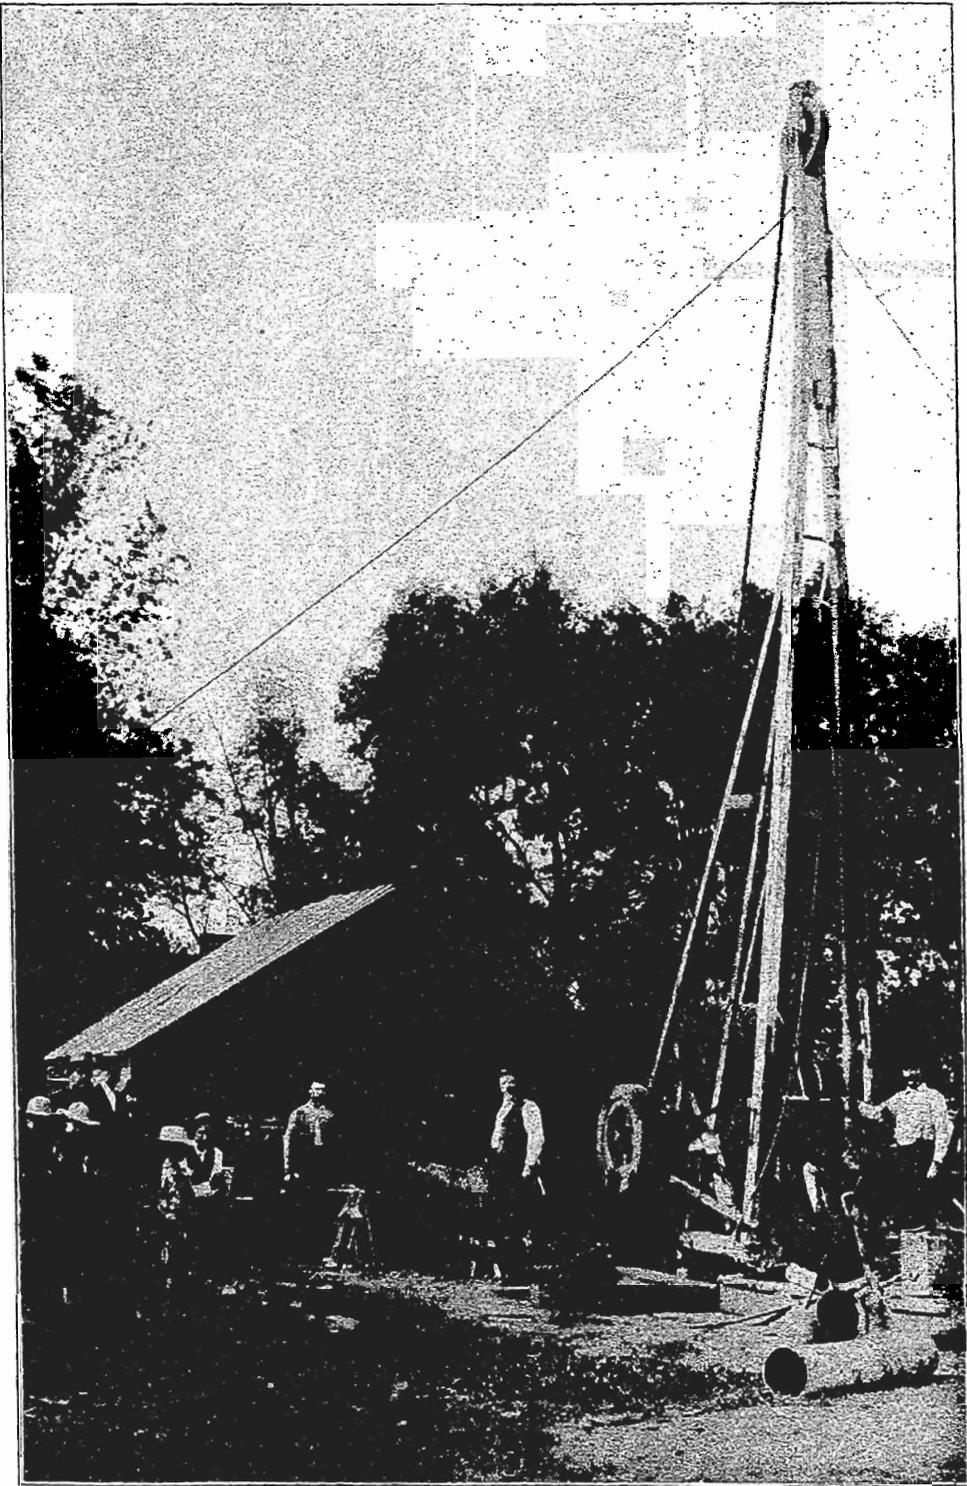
Derrick Tower of J. P. Miller & Co., at Holstein, Iowa.
